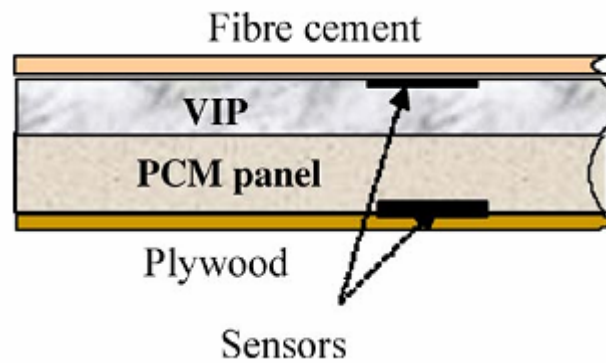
Location of measuring sensors in the wallboard (also suitable for wallboard without PCM layer) [65].
